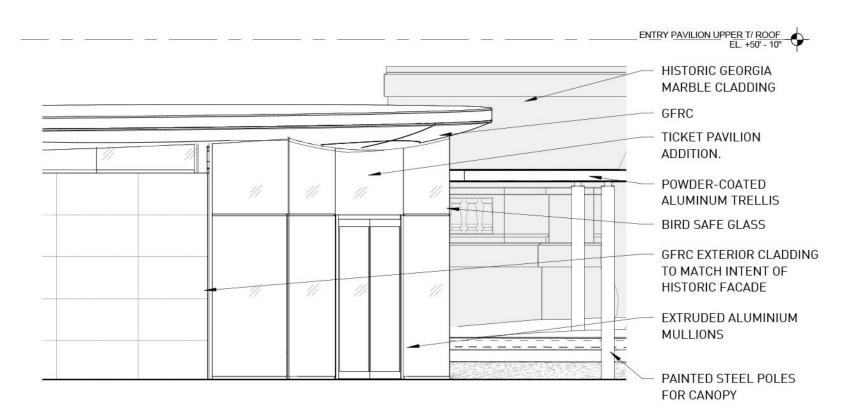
TICKET PAVILION DETAIL ELEVATION
